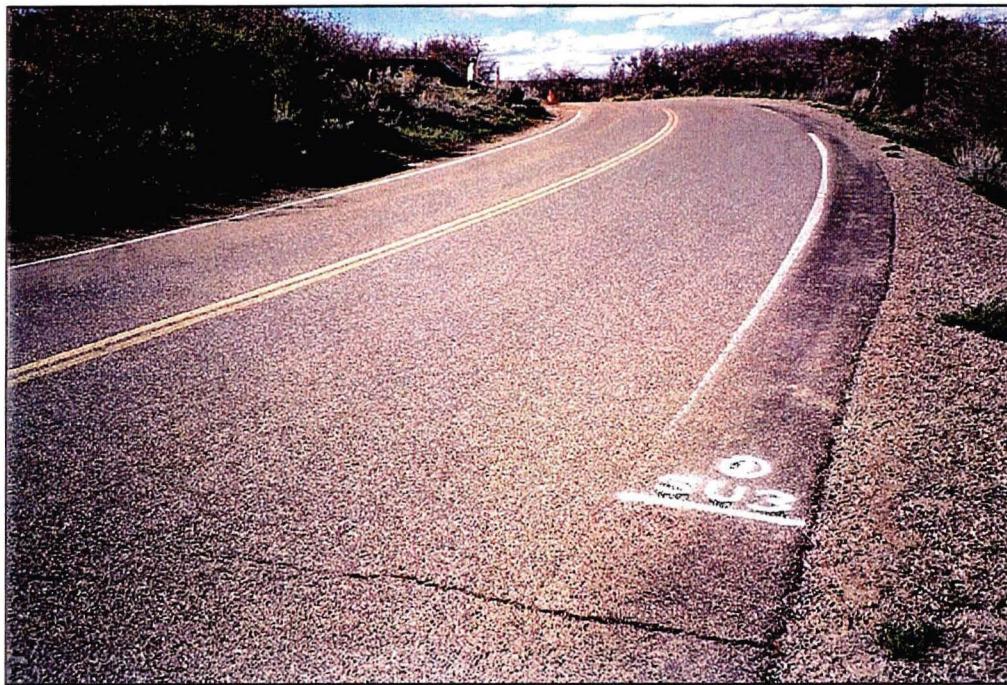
Section 1, Sample Unit 3 (MP 0.08)
